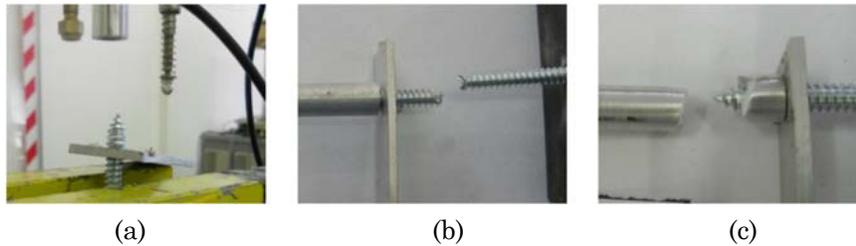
Failure mechanisms in ST specimens: (a) screw pull-out; (b) screw failure; and (c) aluminium failure.
